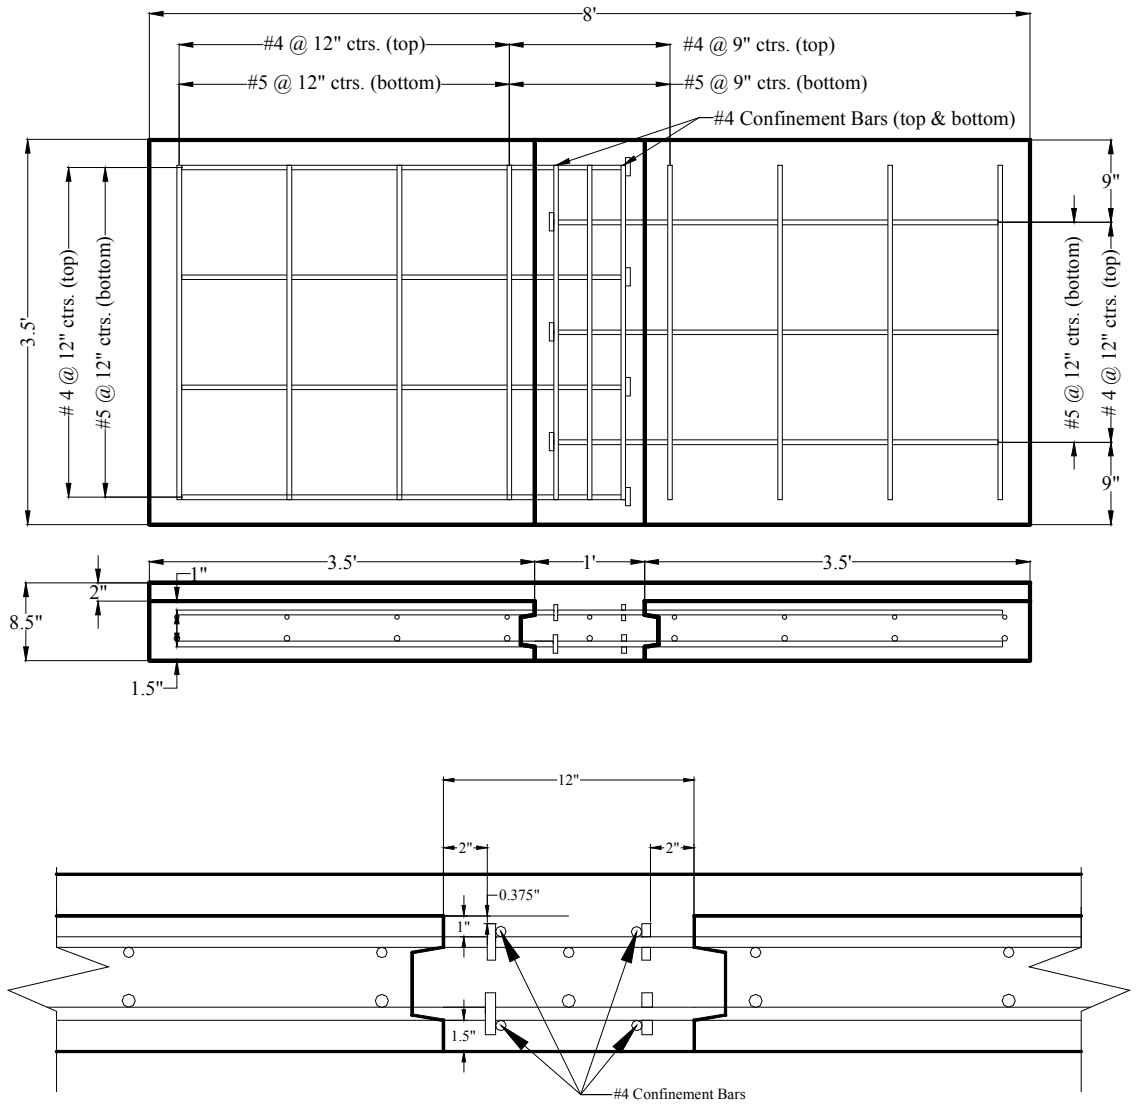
HEADED BAR CONSTRUCTION DETAILS
